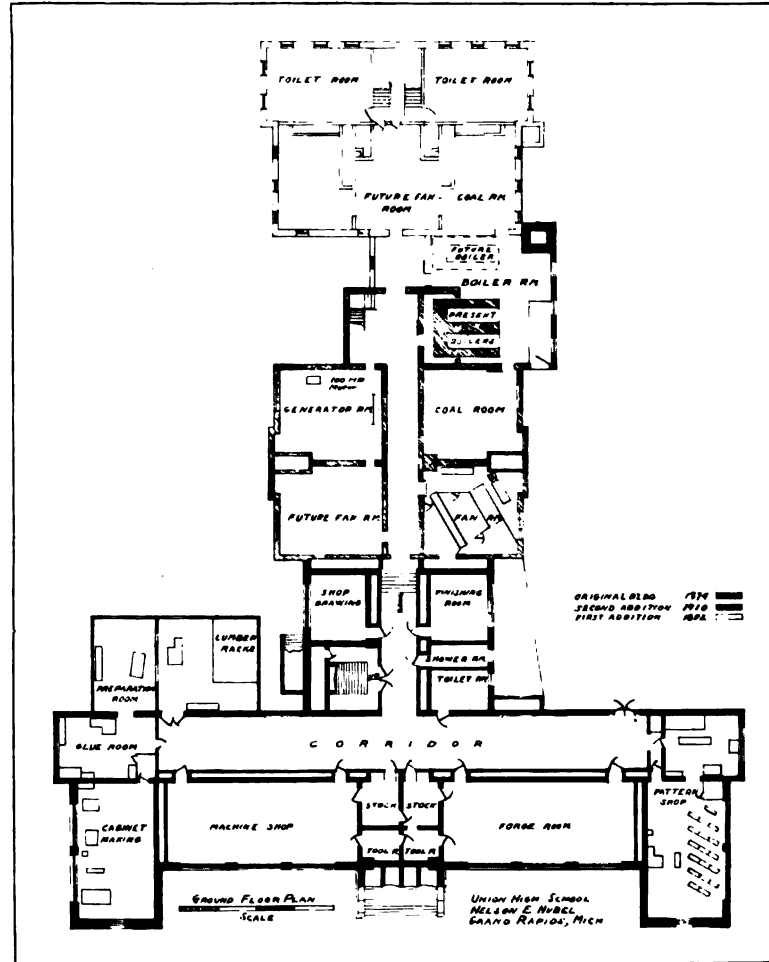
GROUND FLOOR PLAN, UNION HIGH SCHOOL, GRAND RAPIDS, MICH. THE FLOOR PLANS SHOWN ON THIS AND FOLLOWING PAGES WERE DRAWN BY BOYS IN THE EVENING SCHOOL CLASSES.
